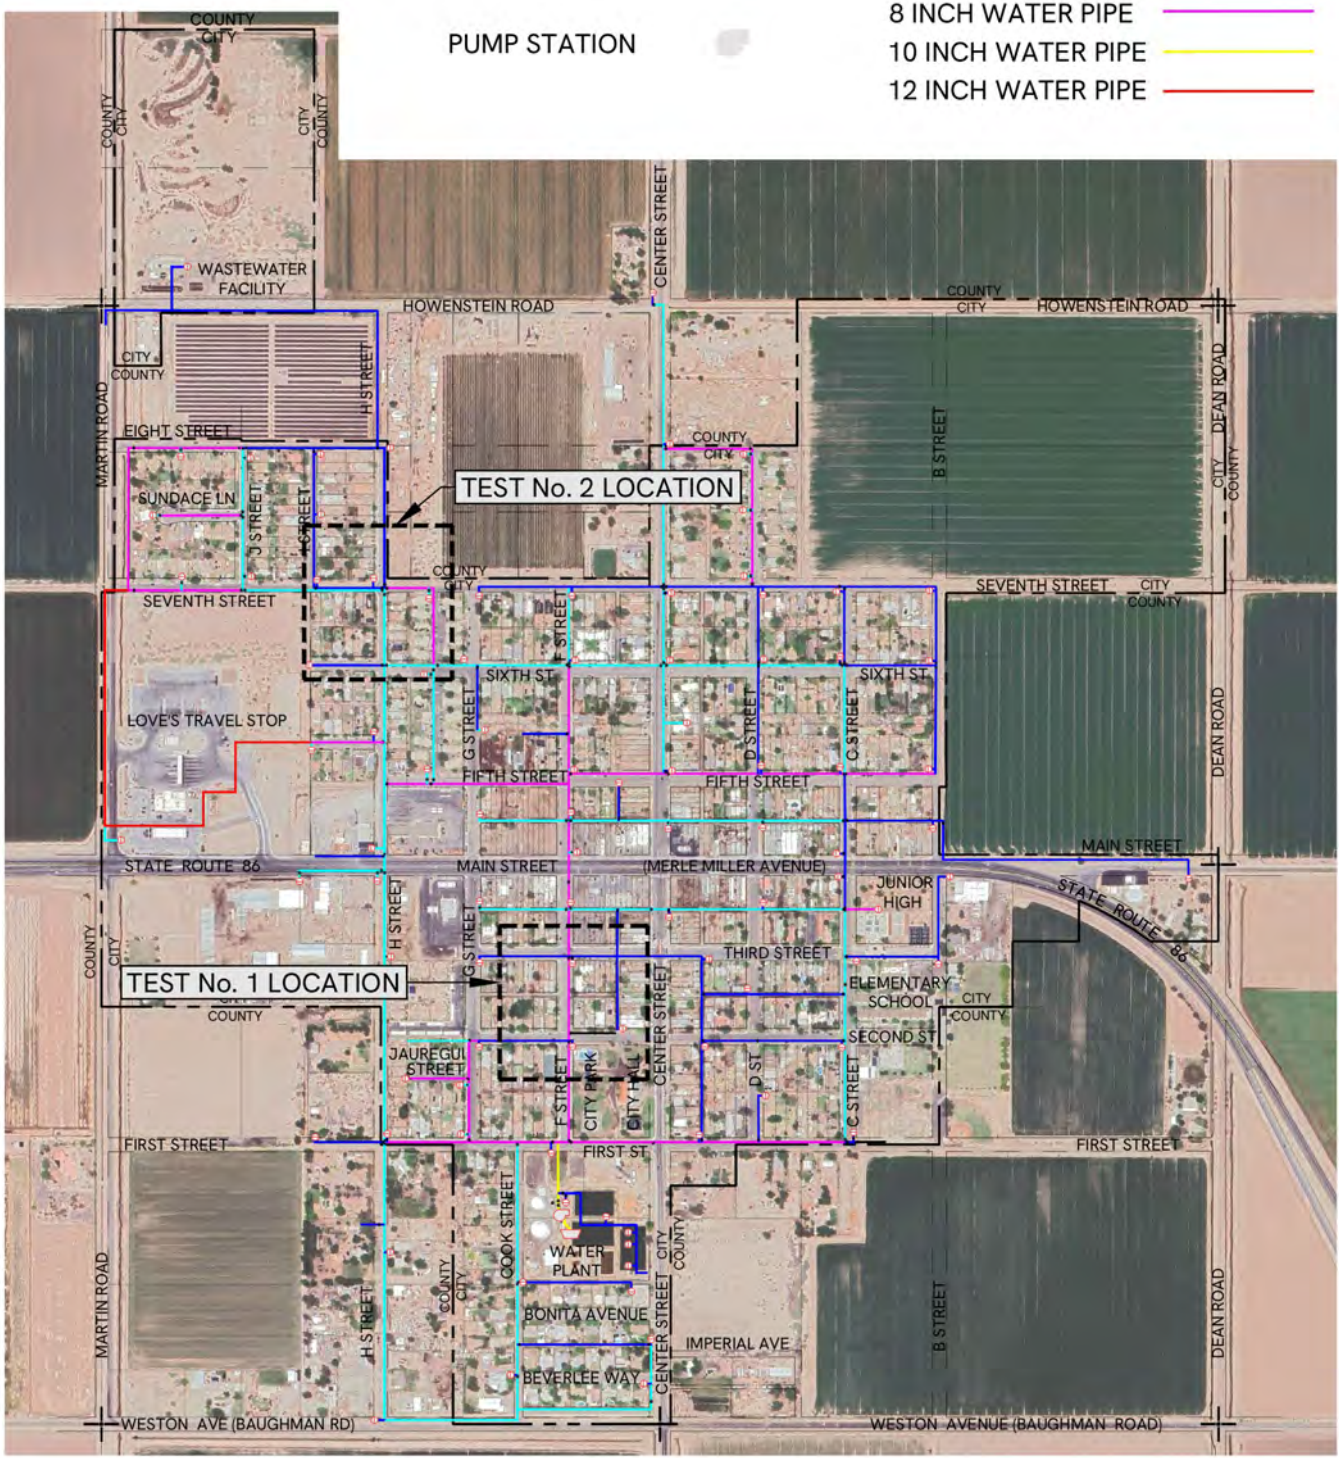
Existing Water Distribution System – Fire Flow Tests Locations
